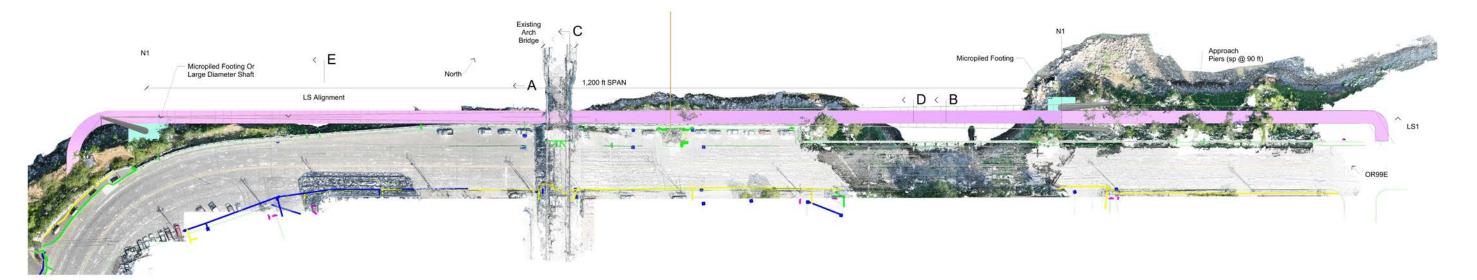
The Fully External Alignment Threading Through the Historic Arch Bridge
